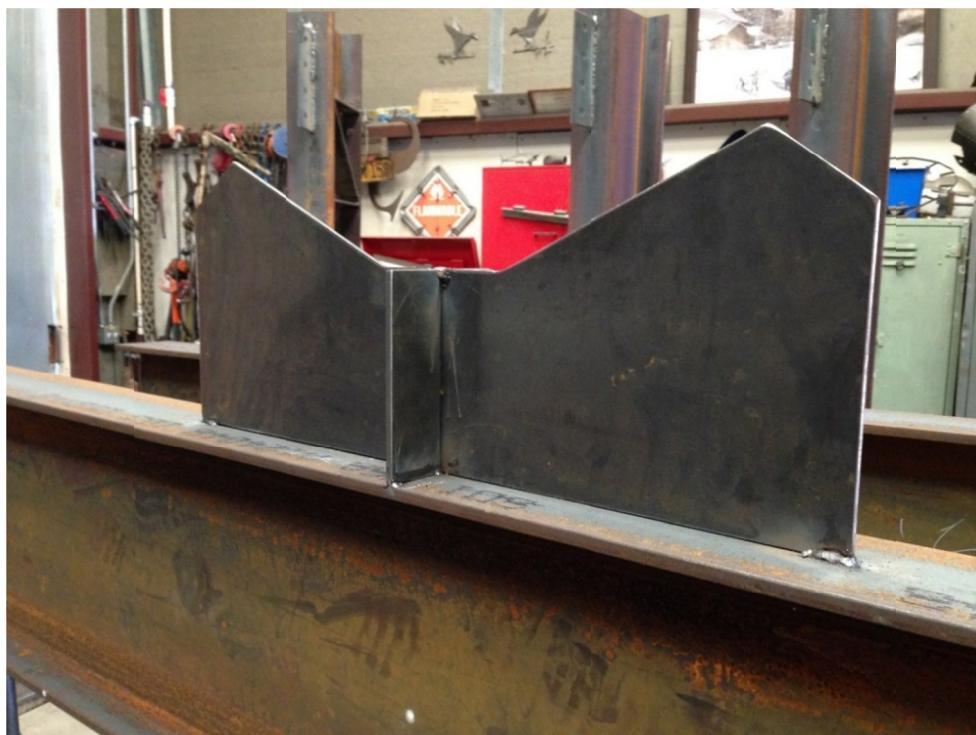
Upper gusset plate welded to the beam flange (upside down).
